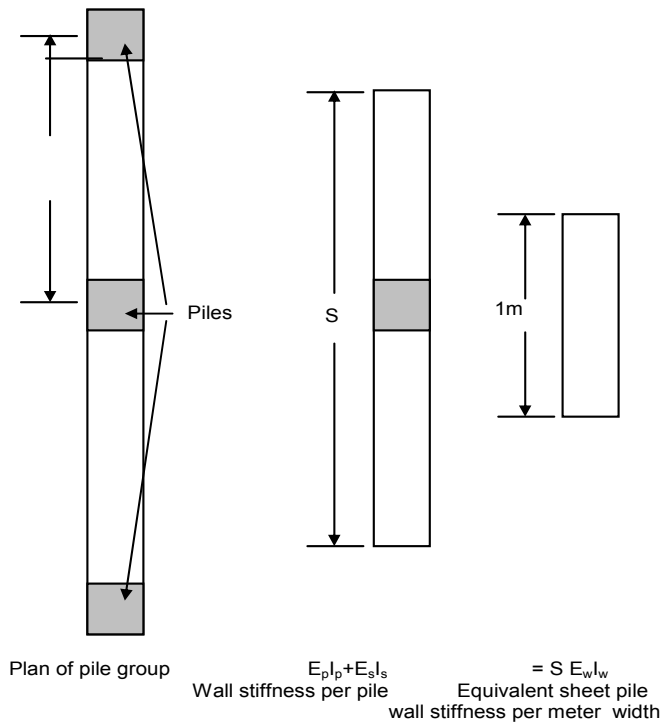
Equivalent Sheet Pile Wall Representation of Piles for Plane Strain Finite Element Analysis
